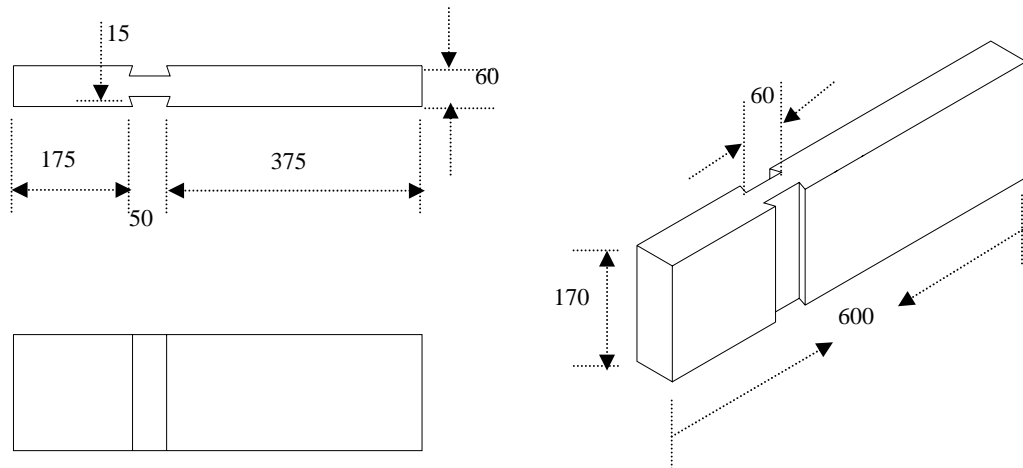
Test specimen dimensions of Part 6 (in mm)
